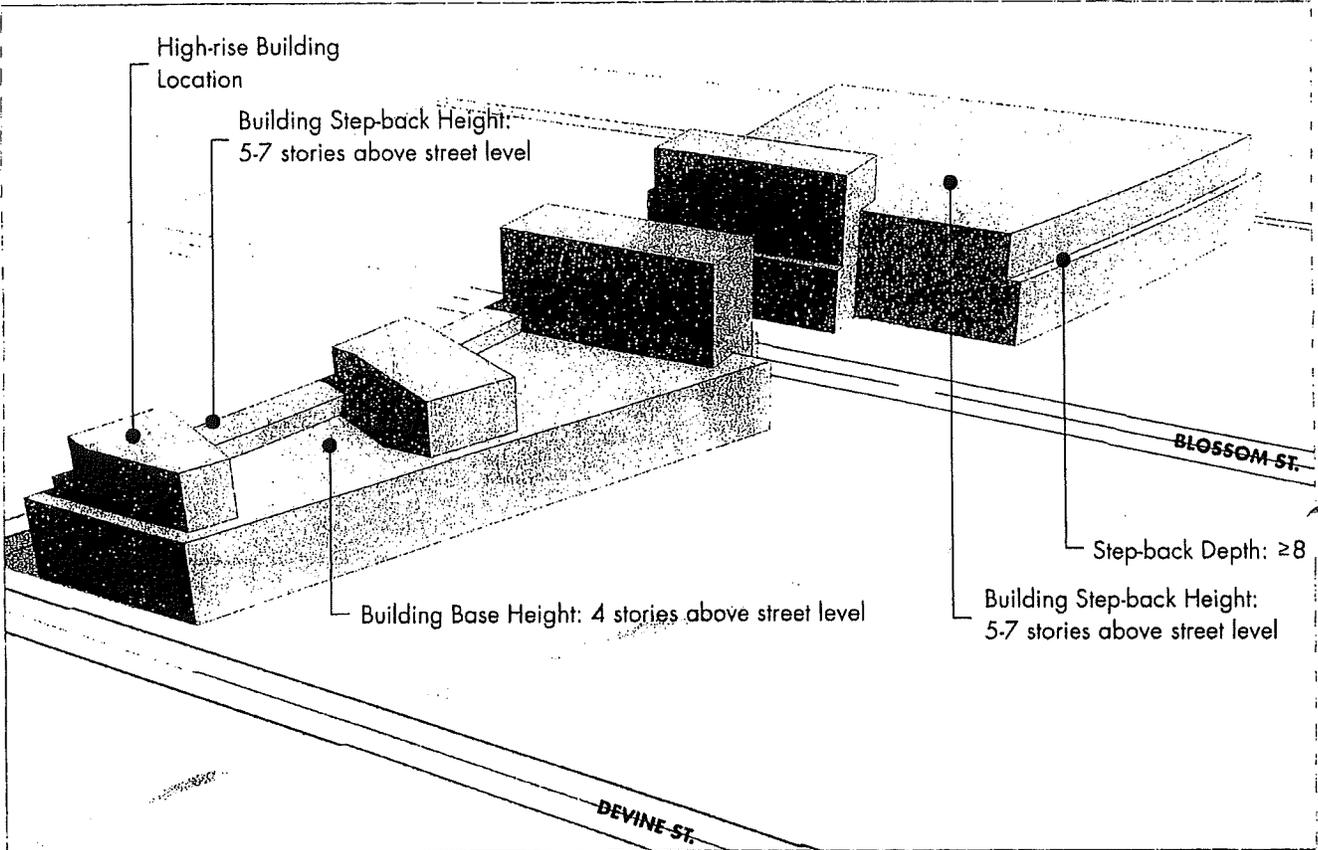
BLOSSOM STREET GATEWAY BUILDING ENVELOPE
